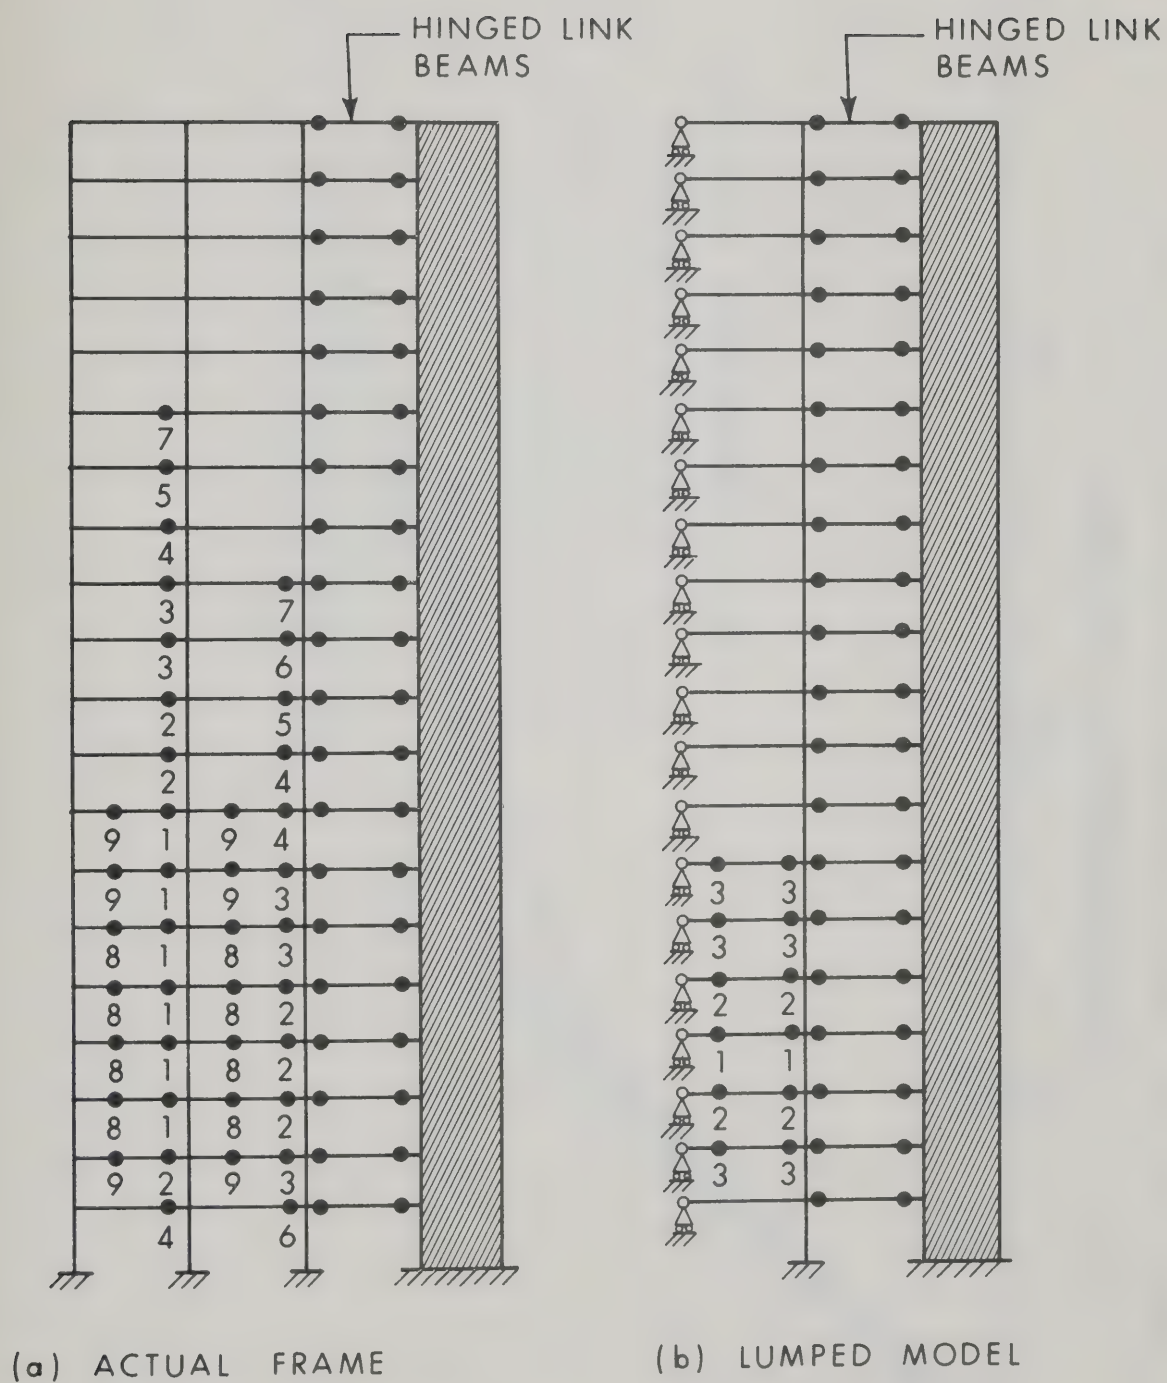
HINGE PATTERN IN TWENTY STORY BUILDING, FRAME 'B'
